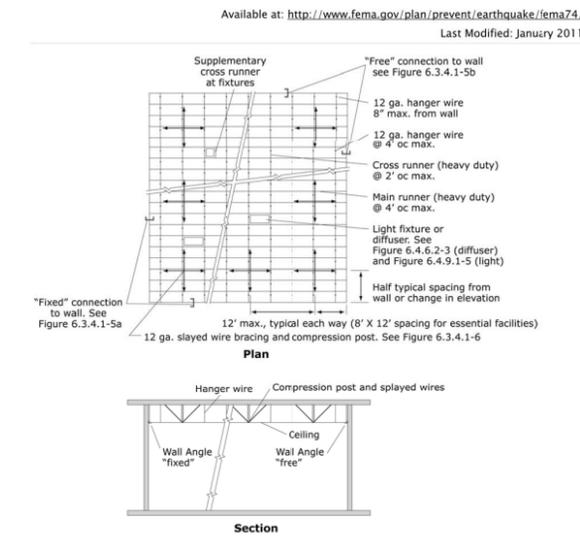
Suspension system for acoustic lay-in panel ceilings - edge conditions (PR).
